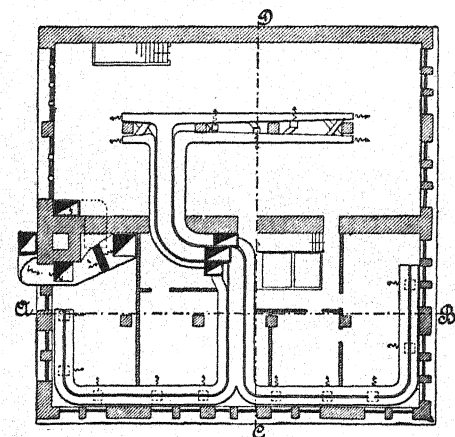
Chicago Telephone Company. Plan of ventilating plant.
